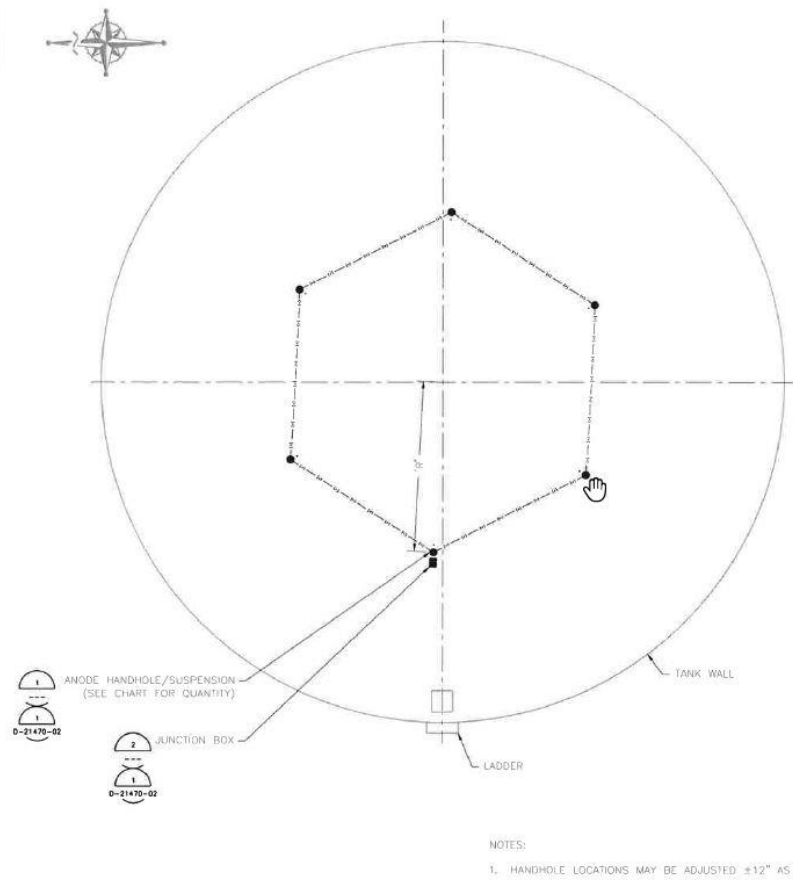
Plan View – Division 22 Galvanic Cathodic Protection System (Installed 2014)
